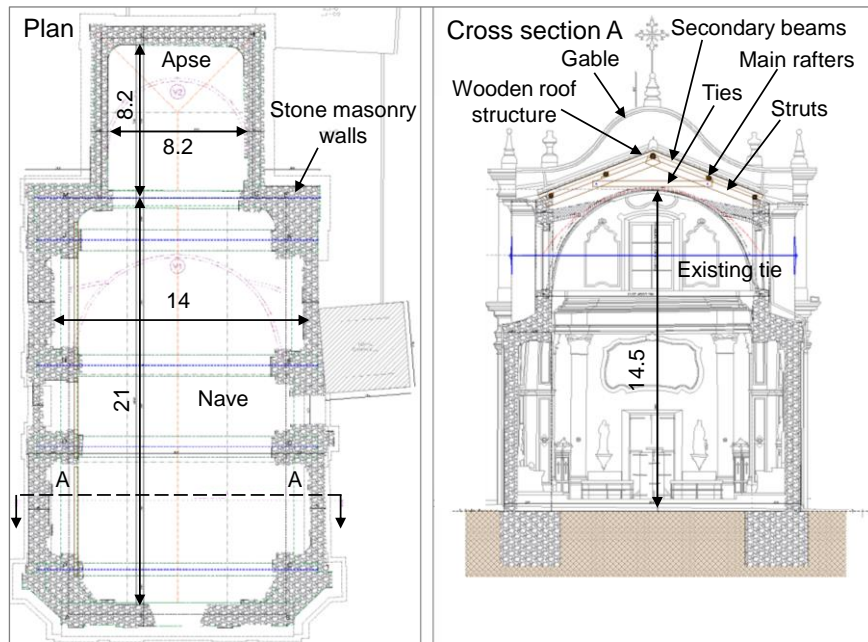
Plan and cross section of the case-study church; dimensions in m.
